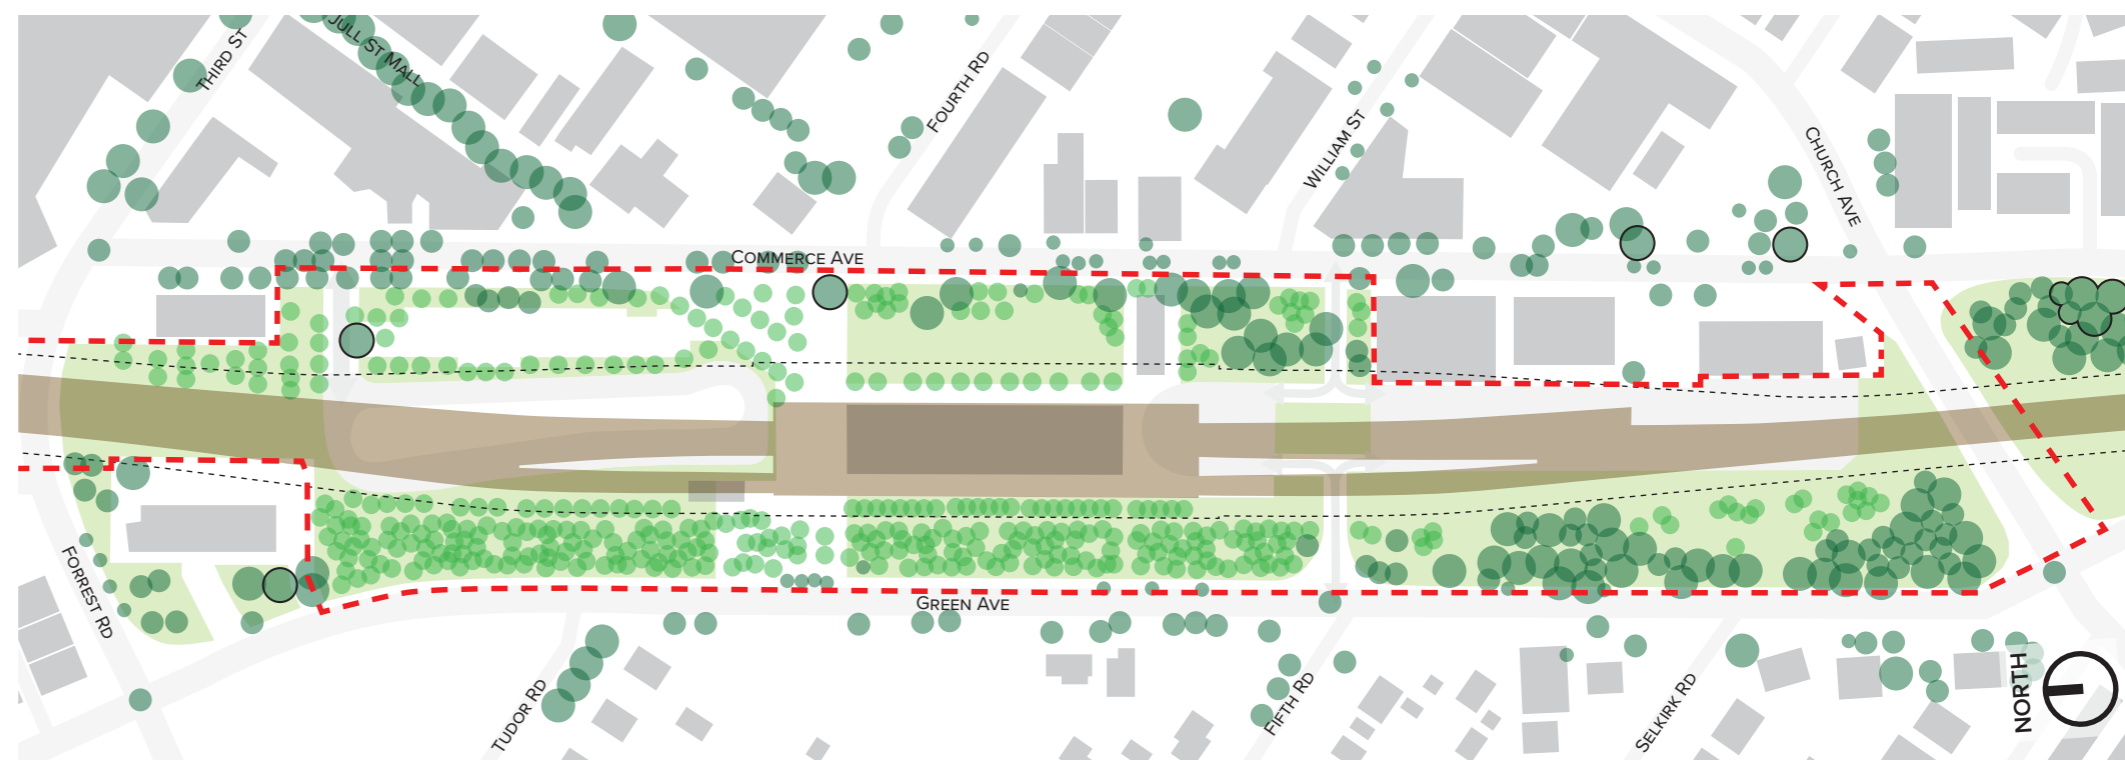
TREES AND SHADE PLAN - SOUTH OF FORREST ROAD
